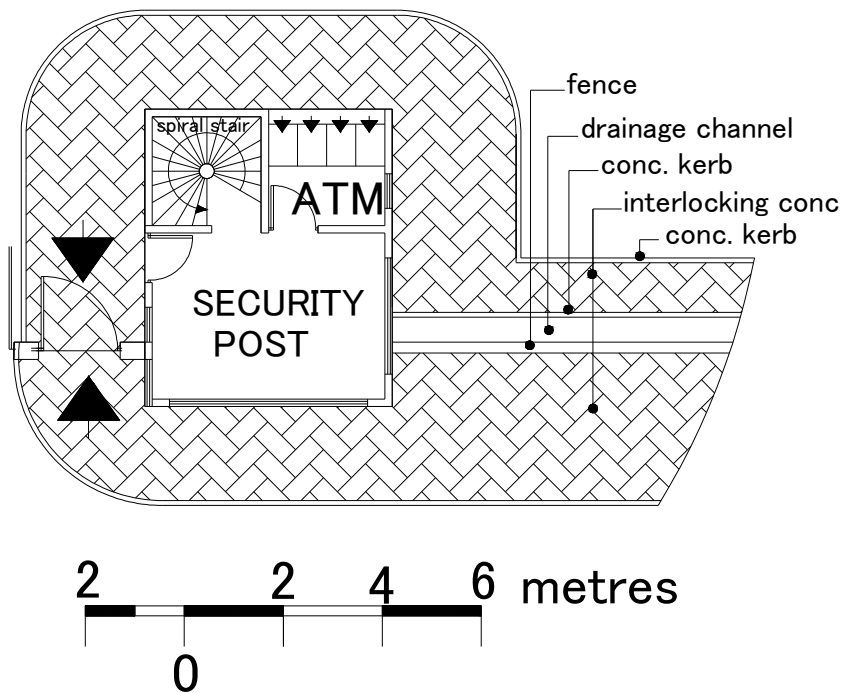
Ground Floor plan at security post showing the Surrounding setup.
